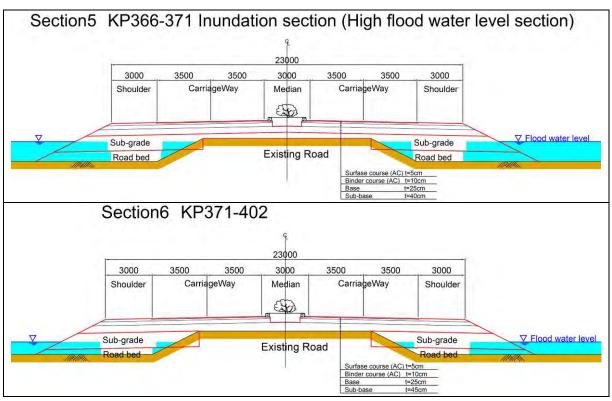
Typical Cross Sections on the Middle Section and Sri Sophorn – Poipet Section
